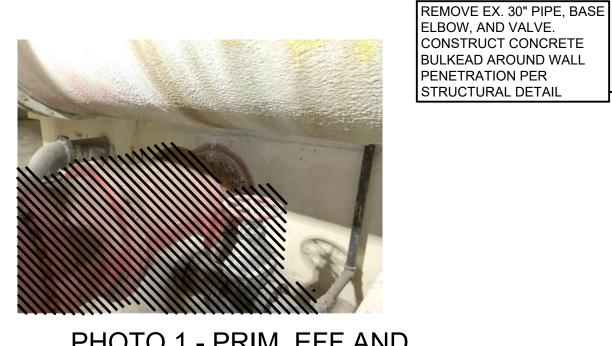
PRIM. EFF AND DRAIN PIPE
